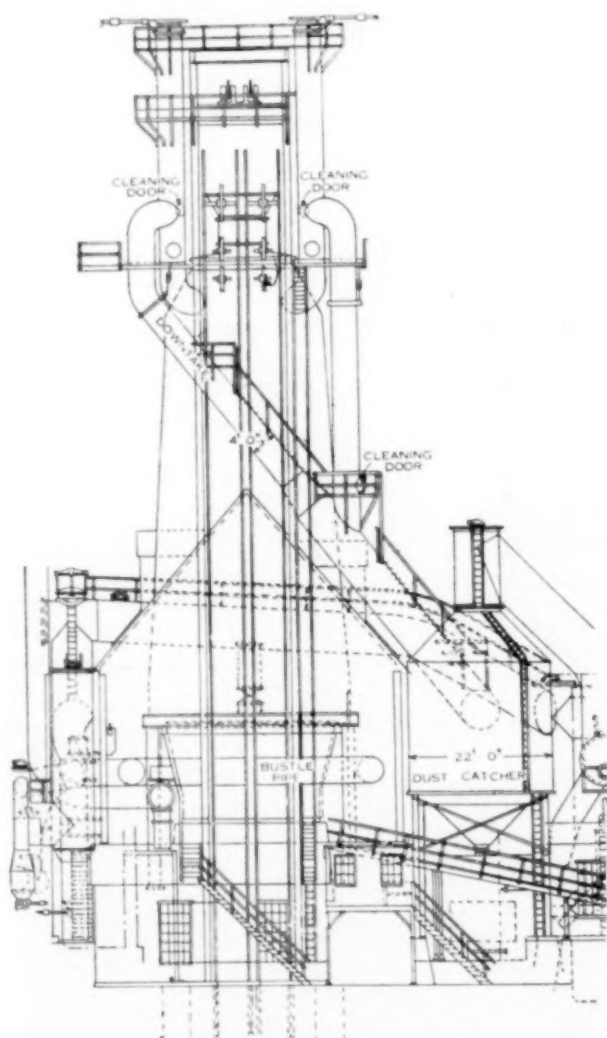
ELEVATION OF BETHLEHEM STEEL CO.'S FURNACE SHOWING CORRECT DESIGN OF GAS OUTLETS
